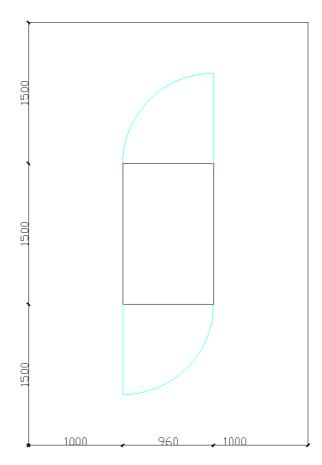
Schematic Diagram of Single Cabinet Installation Space Requirements (unit: mm)
